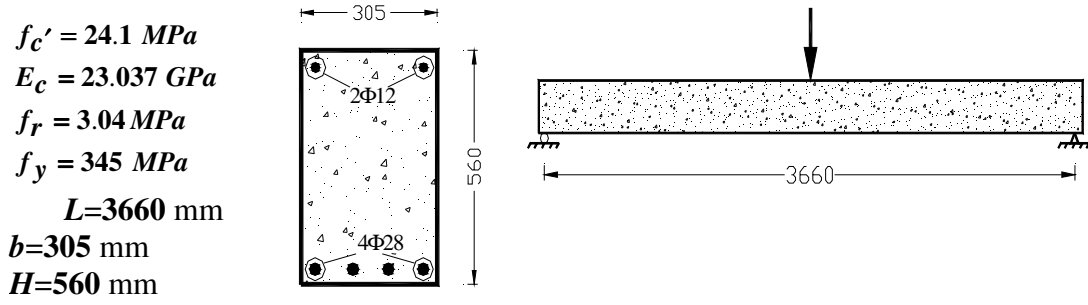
Details of a reinforced concrete simply supported beam under concentrated load at mid span with $(L/H=6.53)$ (Bresler and Scordelis)
